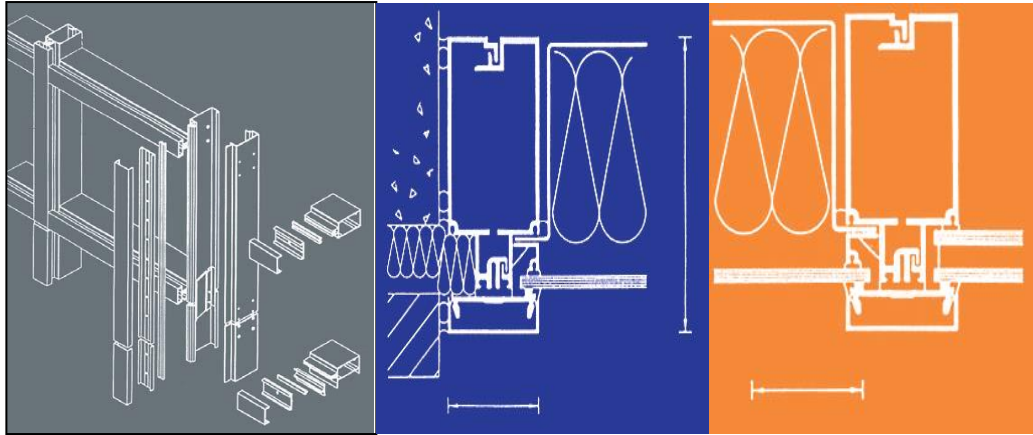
Typical Components of Stick Built Curtain Wall System
